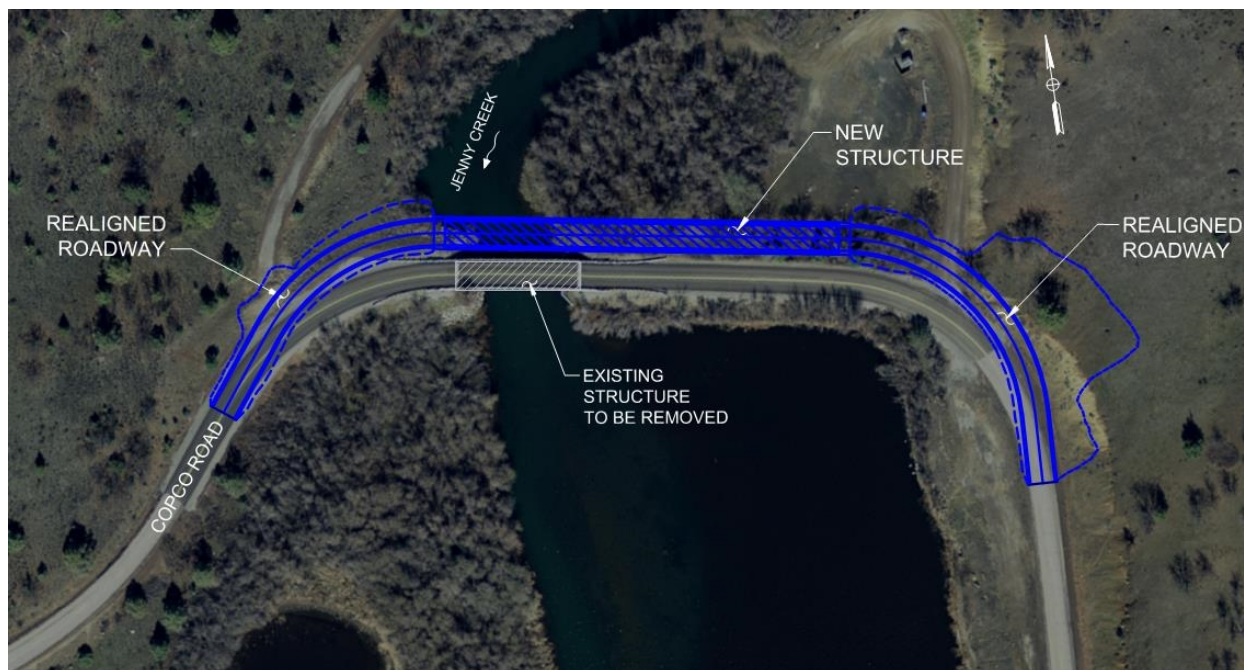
Copco Road Realignment and Jenny Creek Bridge Replacement
